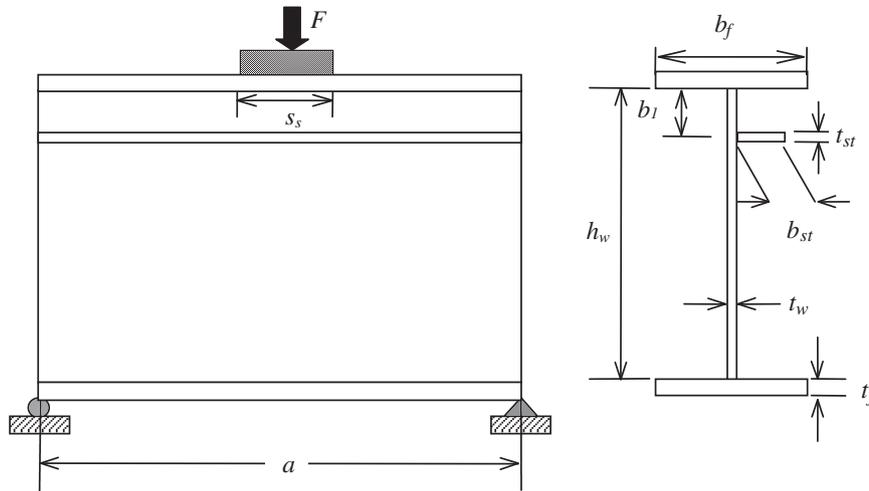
A longitudinally stiffened plate girder under patch loading.
